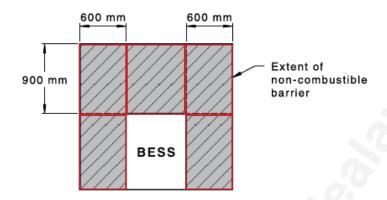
Barrier zones for pre-assembled integrated BESS installed on or near a habitable room facing wall
